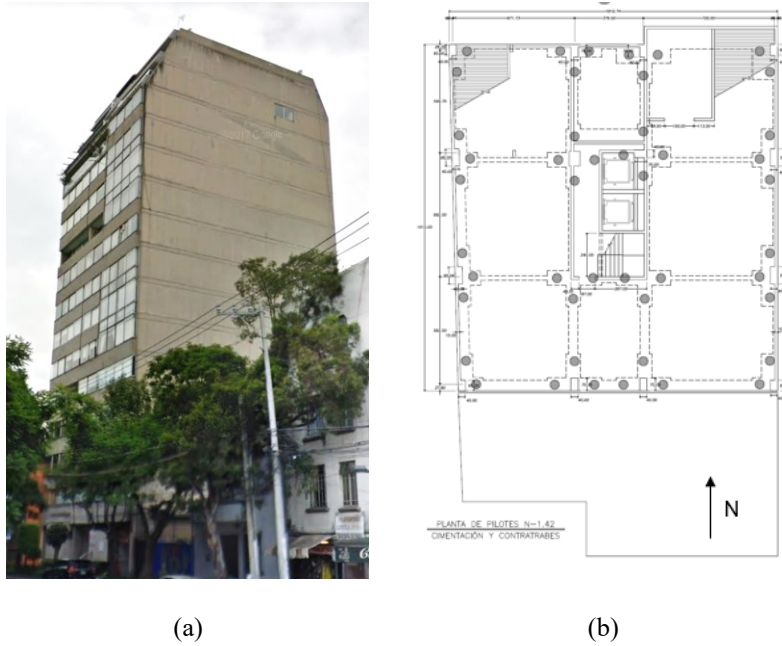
(a) Sixteen-story residence building (courtesy of Google Map) and (b) floor plan drawing.
